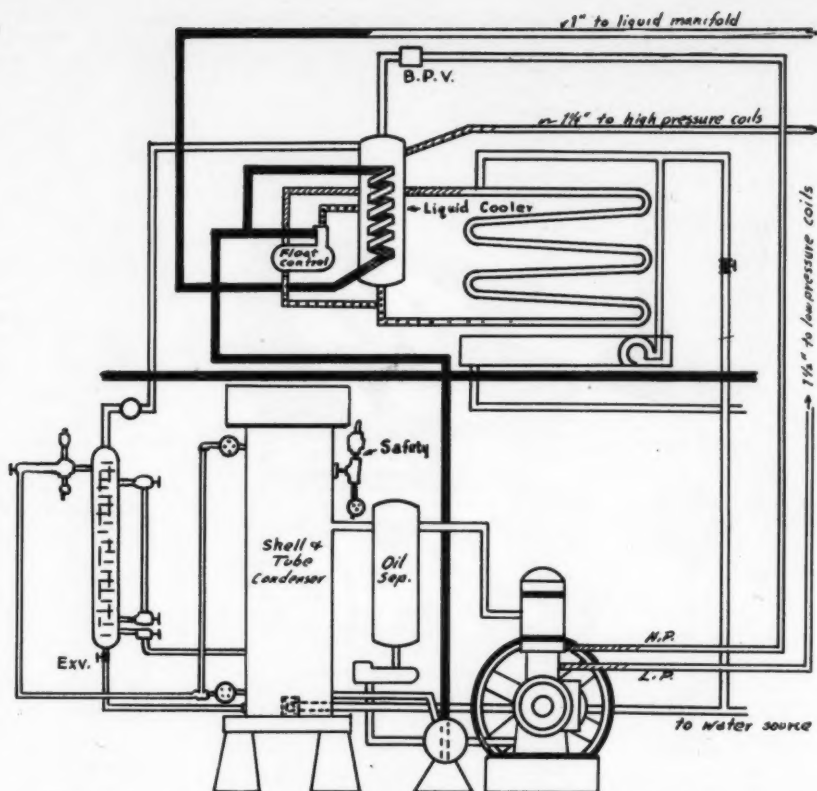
CONDENSER UNIT HOOK-UP SHOWING LIQUID COOLER AND PURGER
